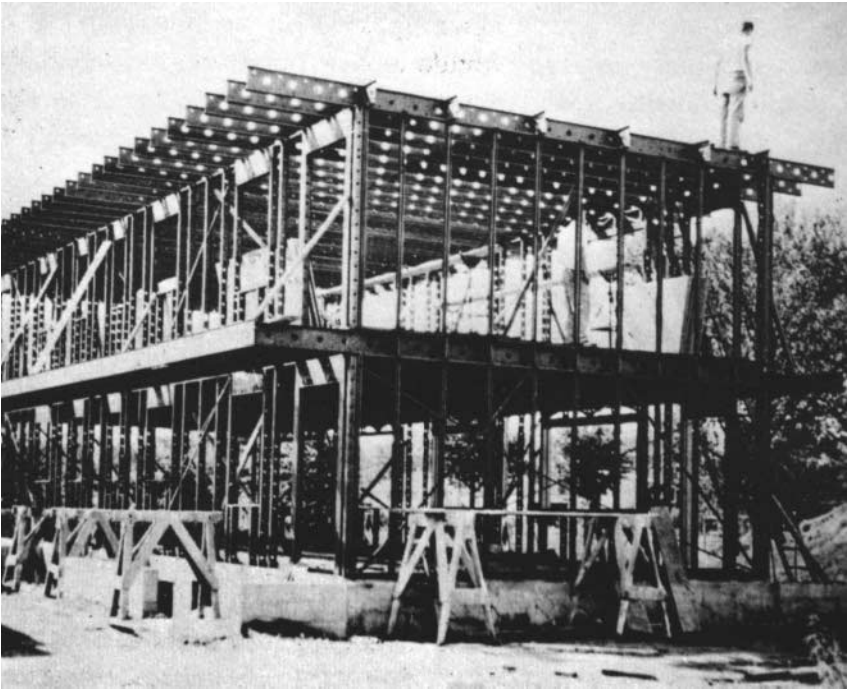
Building composed entirely of cold-formed steel sections. (*Penn Metal Company.*)^{1.7}
